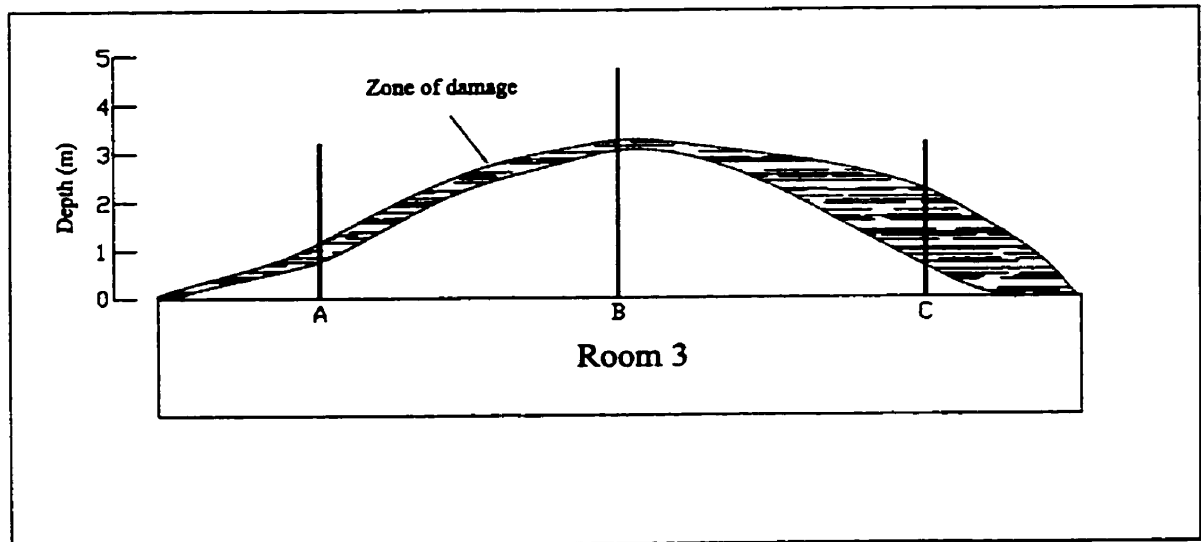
Mapping of cracking in the roof of Room 3 (The lines in the hatched zone of damage are not actual cracks)
